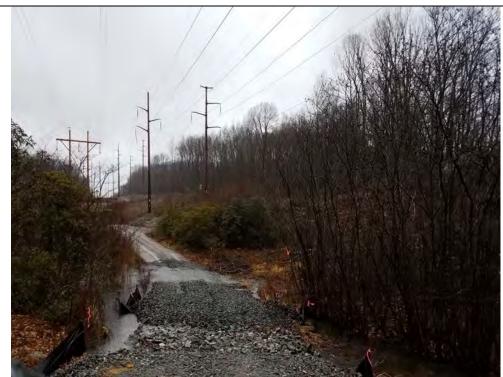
03/02/2018, Thomaston: Map 25, S-E3 crossing between Str71 and Str72, Photo taken facing north towards Str72, water overflowing access road approximately 20-feet south of the constructed crossing.
